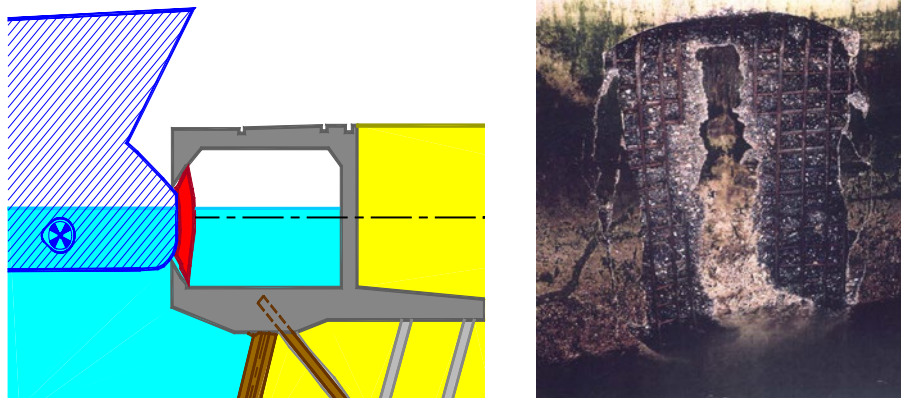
Damaged quay wall and impression of the damage of front of quay wall.
